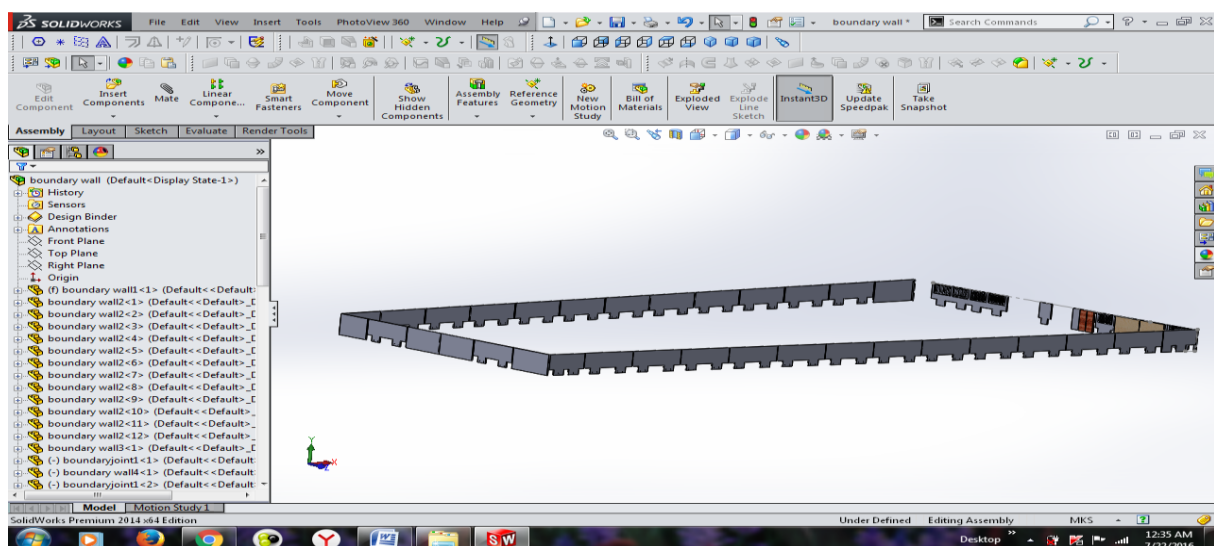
A 3D rendition of KhanSaheb's boundary wall project
